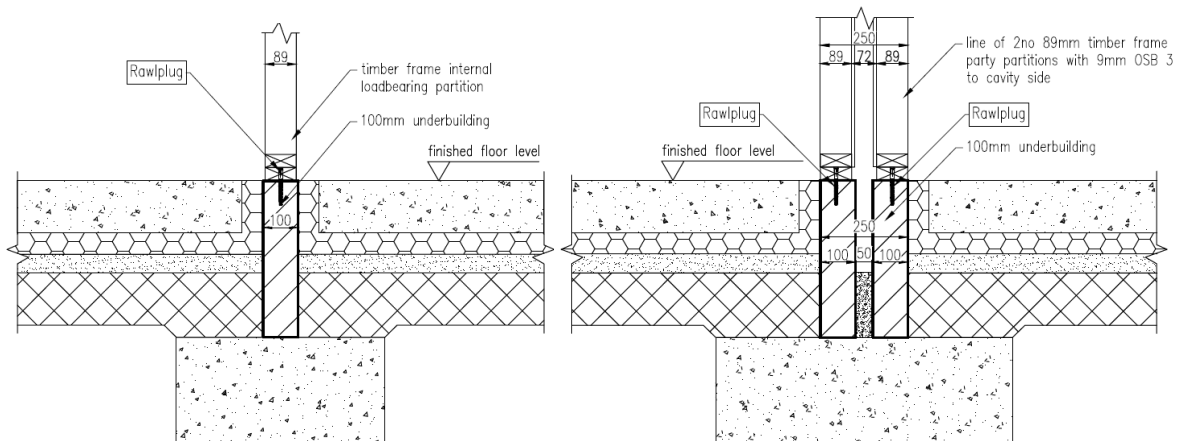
Internal ground floor loadbearing wall (left) and party wall (right) (Cygnum)
